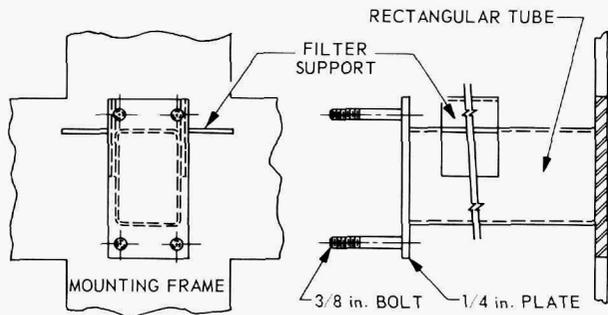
Mounting frame made from a single plate. Details of filter clamping device.
